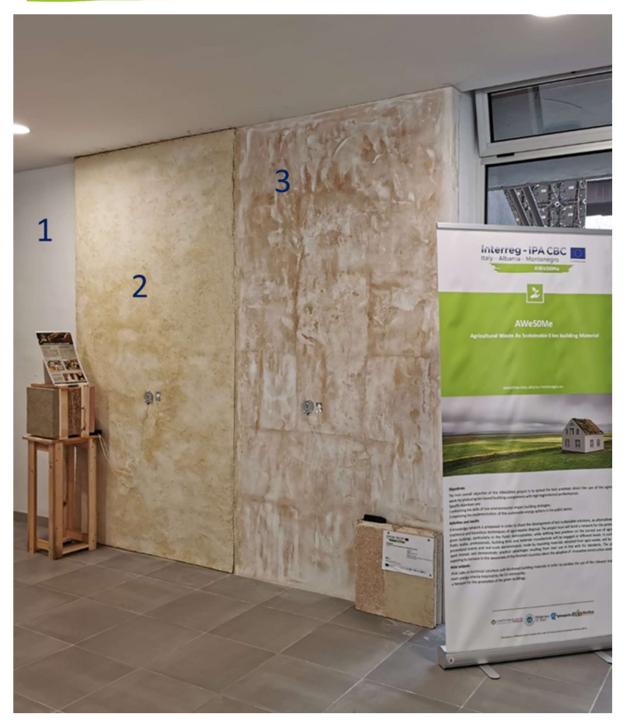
Assessed wall, from left to right: 1) reference wall, 2) wall covered by lime-straw mix, 3) wall with lime plaster blocks.
